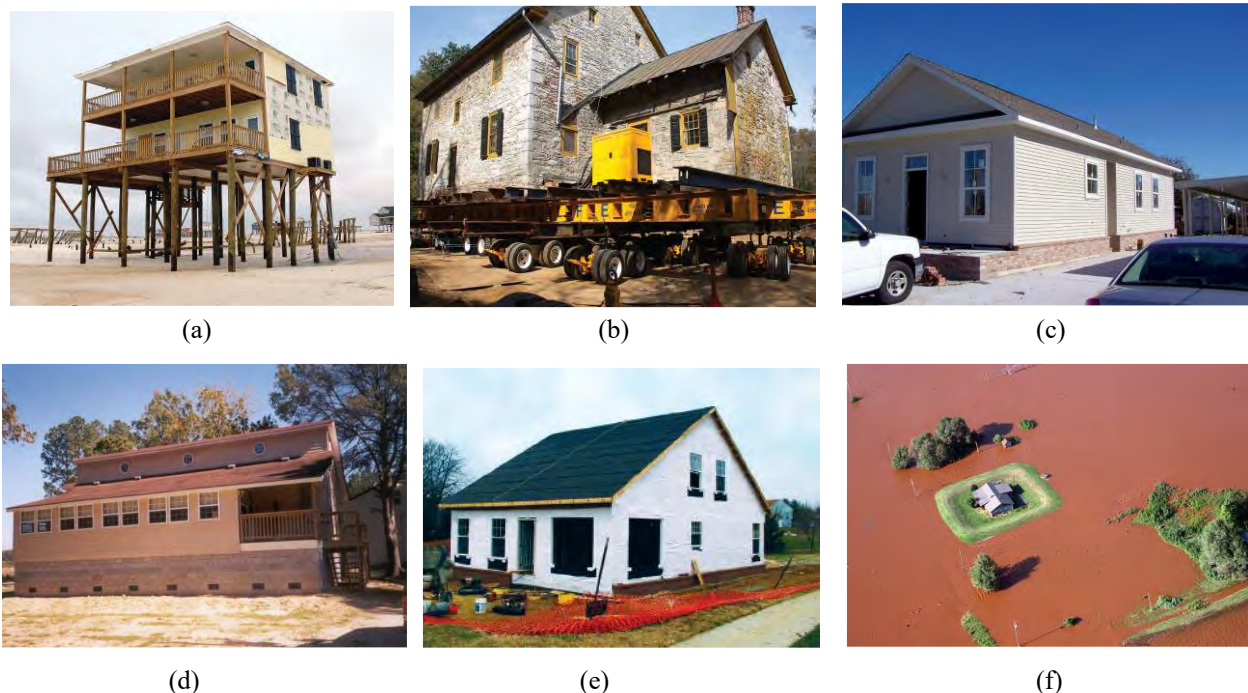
Practical examples for six available retrofit methods recommended by FEMA (FEMA P-312): (a) elevation; (b) relocation; (c) demolition; (d) wet floodproofing; (e) dry floodproofing; (f) barrier system.
